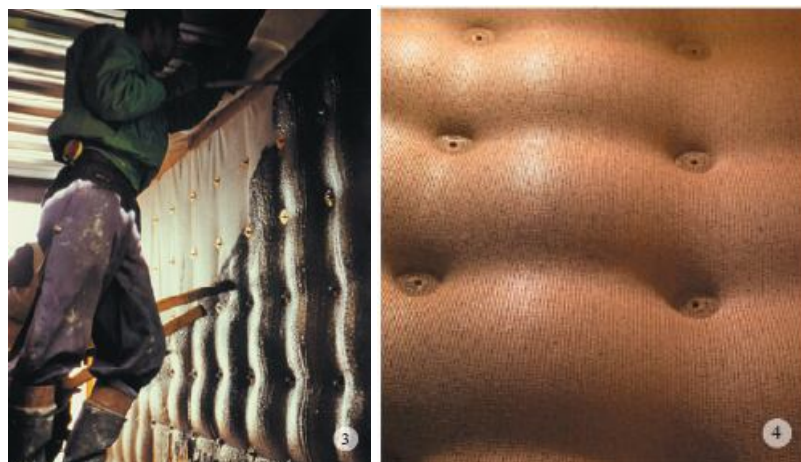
The fabric-formed wall construction of the Quilt point method. Photo 3 by Tsunenori Yamashita (Tokyo, Japan) and Photo 4 by Mark West (Manitoba Canada).
